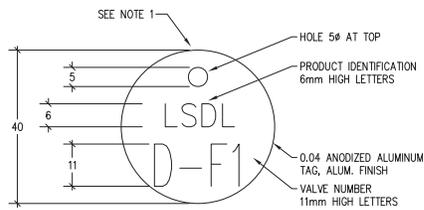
VALVE TAGS FOR DIESEL FUEL SYSTEM
